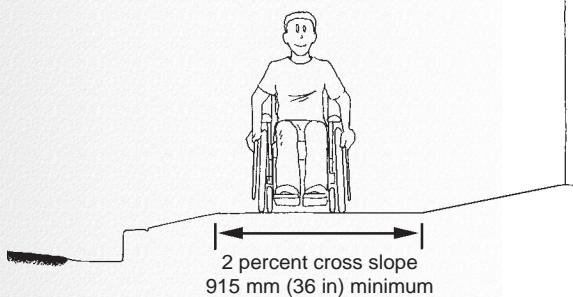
GOOD DESIGN: A level area at least 915 mm (36 in) wide improves access when the street elevation is lower than the building elevation.
